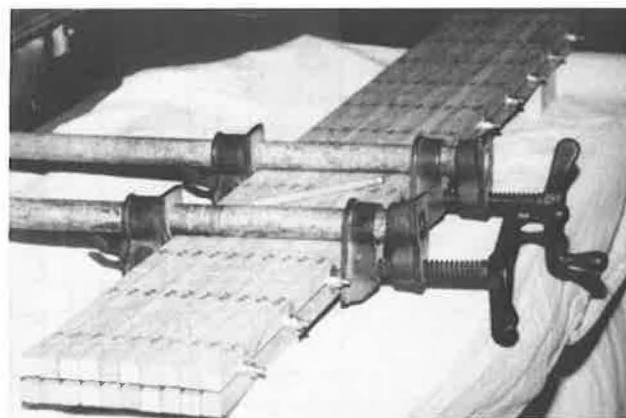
Clamping technique used before bolt tightening of the bilayer model bridge.
